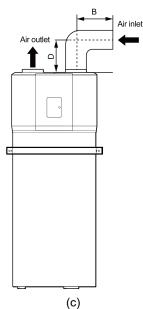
Installation diagram of air inlet and outlet ducts
